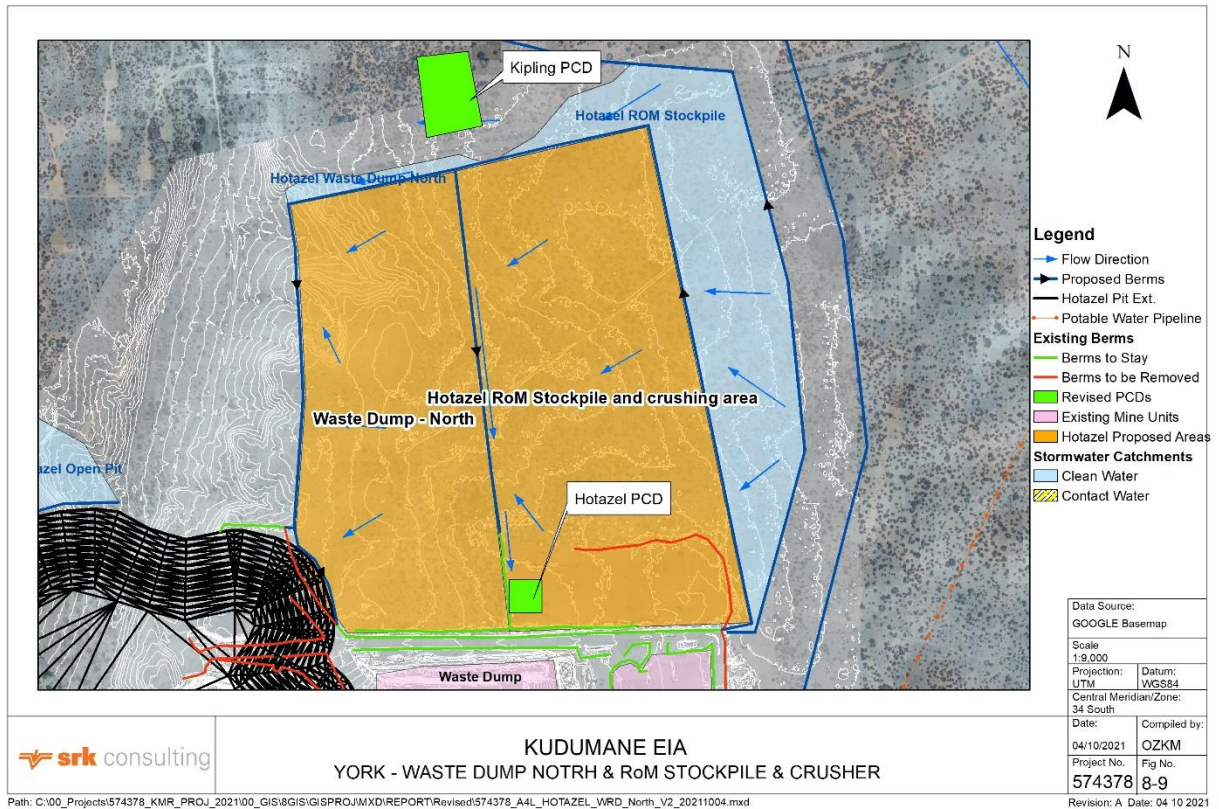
Proposed Stormwater Management Plan at Hotazel Waste Dump North and Stockpile Area
